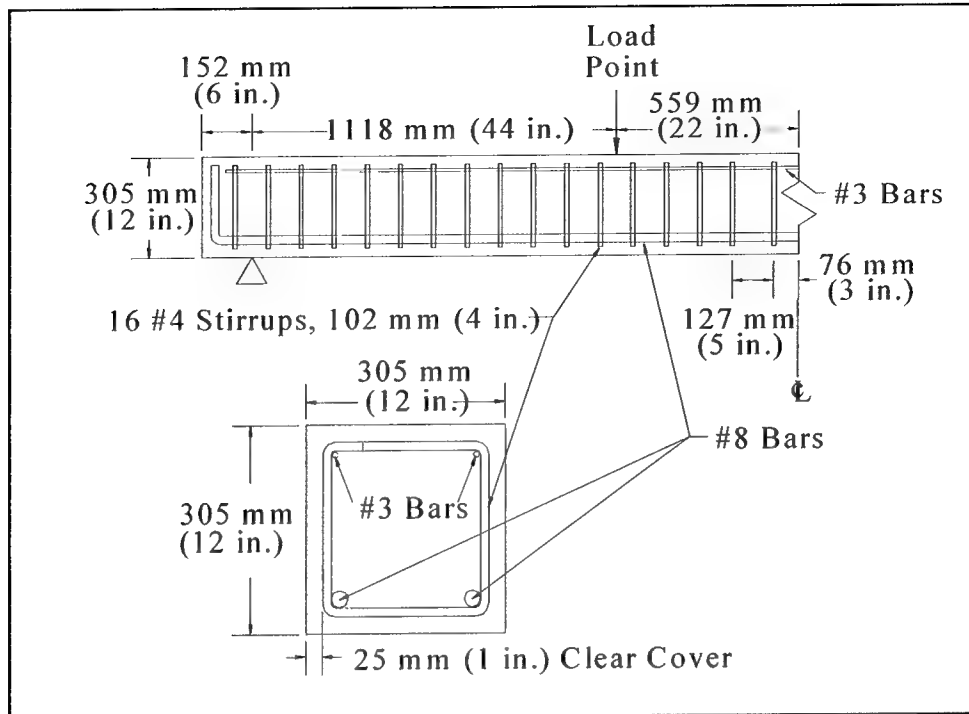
Large-scale beam dimensions and internal reinforcement layout
